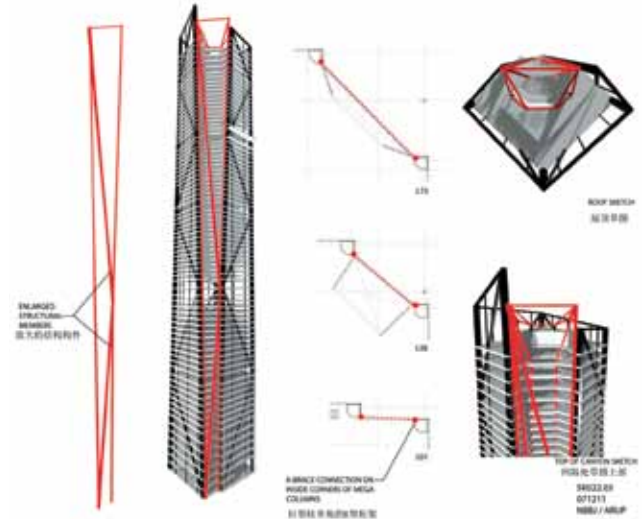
Eton Dalian Center, “dragon brace” structural diagram. (Source: NBBJ)
